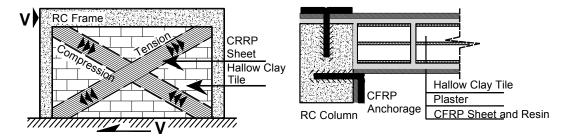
CFRP anchorage application detail of masonry infilled RC frame
